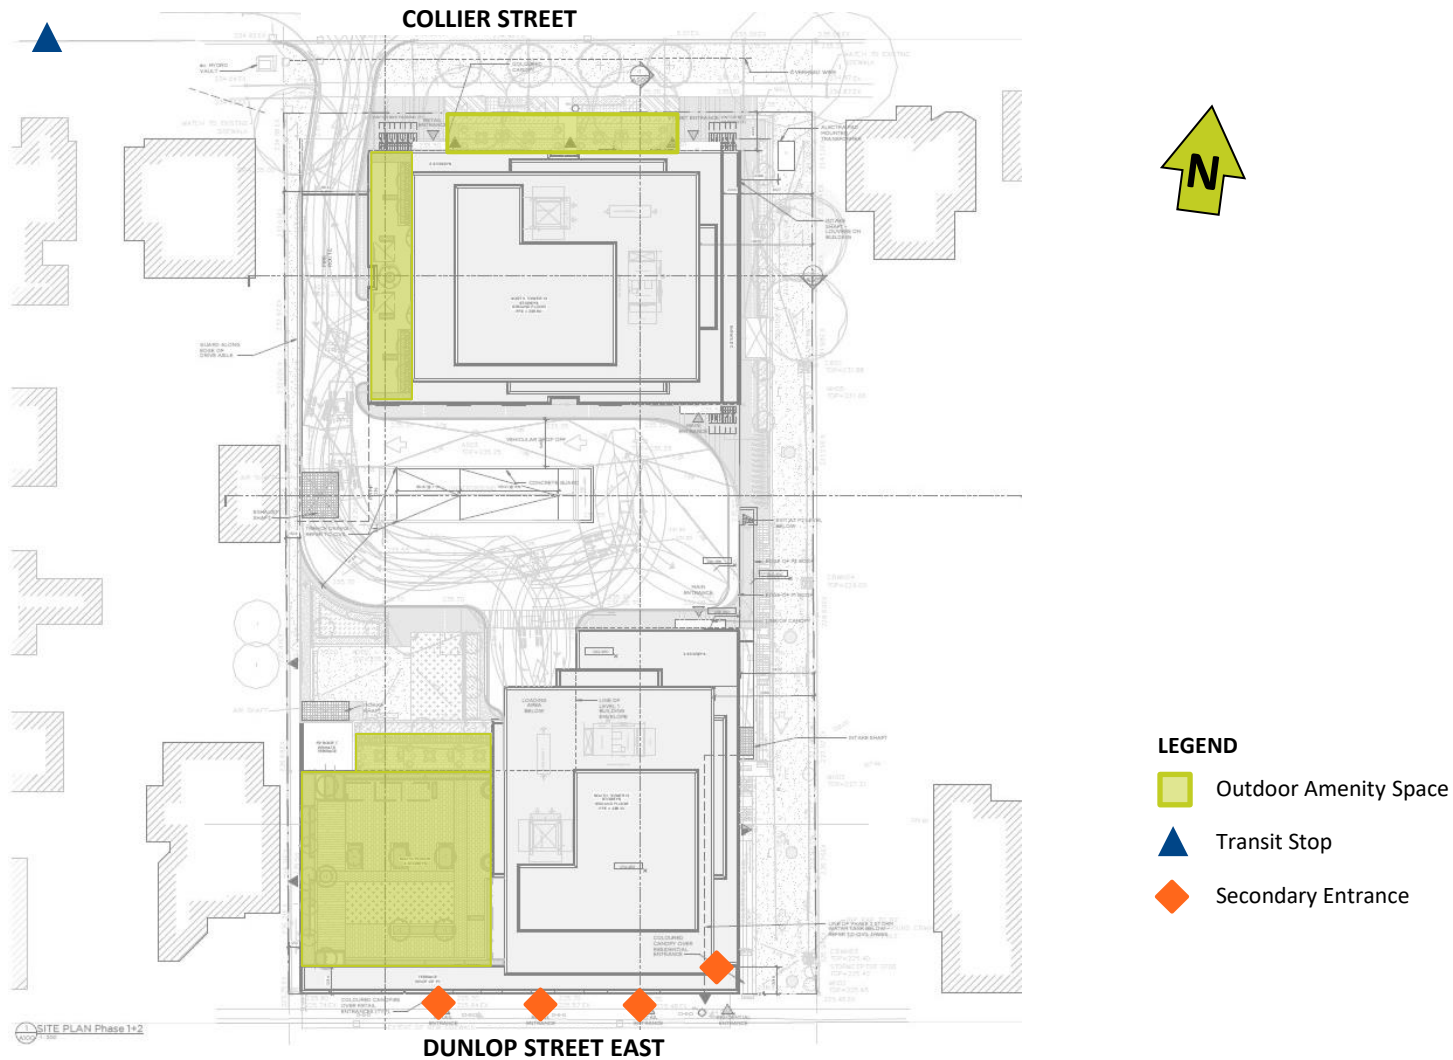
Areas of Interest – Outdoor Amenity areas, Transit Stop and Secondary Entrances (Ground Floor – P3 Plan)
